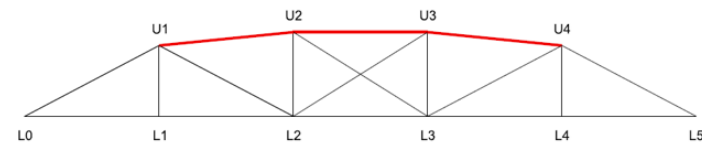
Overstressed Truss Members (Spans 1, 5, and 6) – Rehabilitation with Widening
